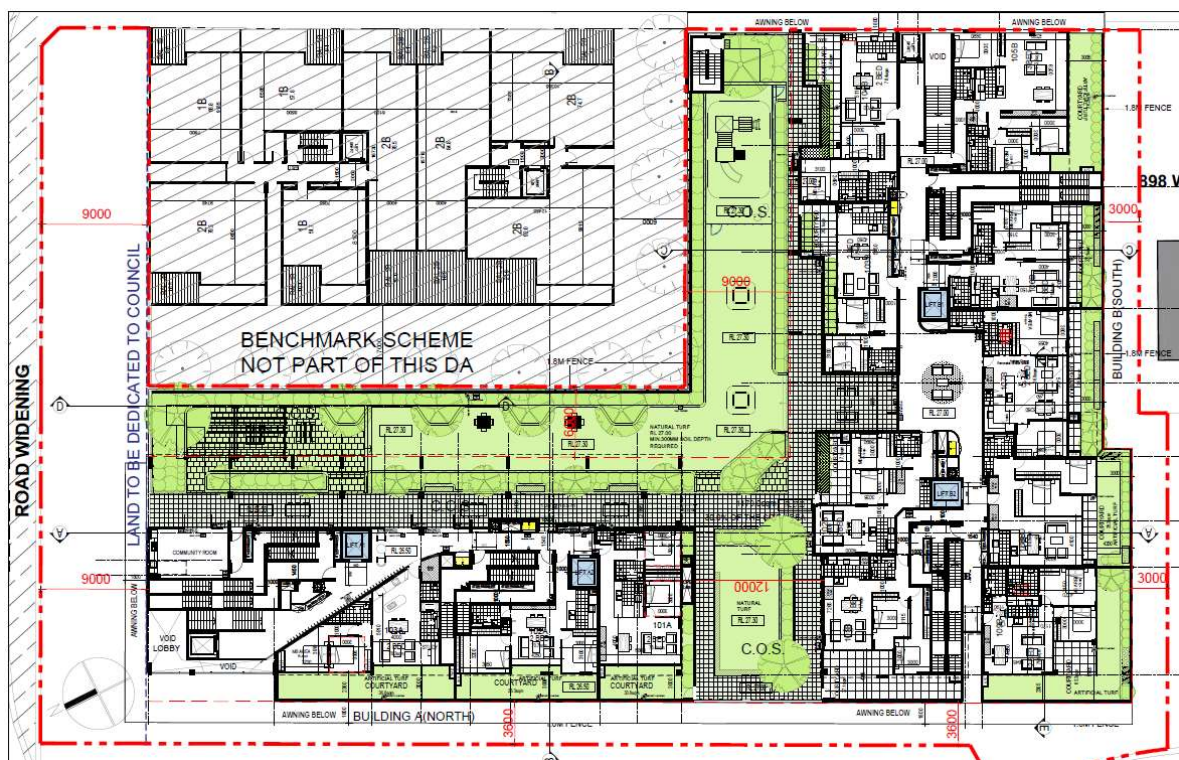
Proposed First Floor Plan including a concept illustrating how the neighbouring service station can be developed in future.
